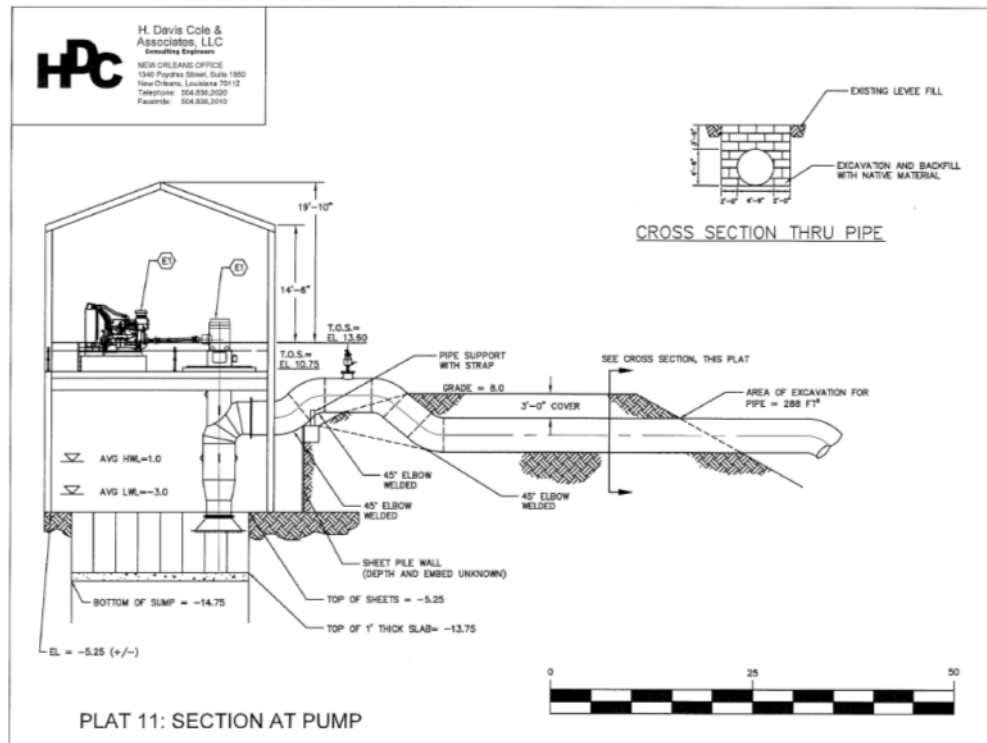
H. Davis Cole & Associates Consulting Engineers profile view of new pump and outlet pipe running through levee for the City Barn Drainage Improvements Project in Slidell.
